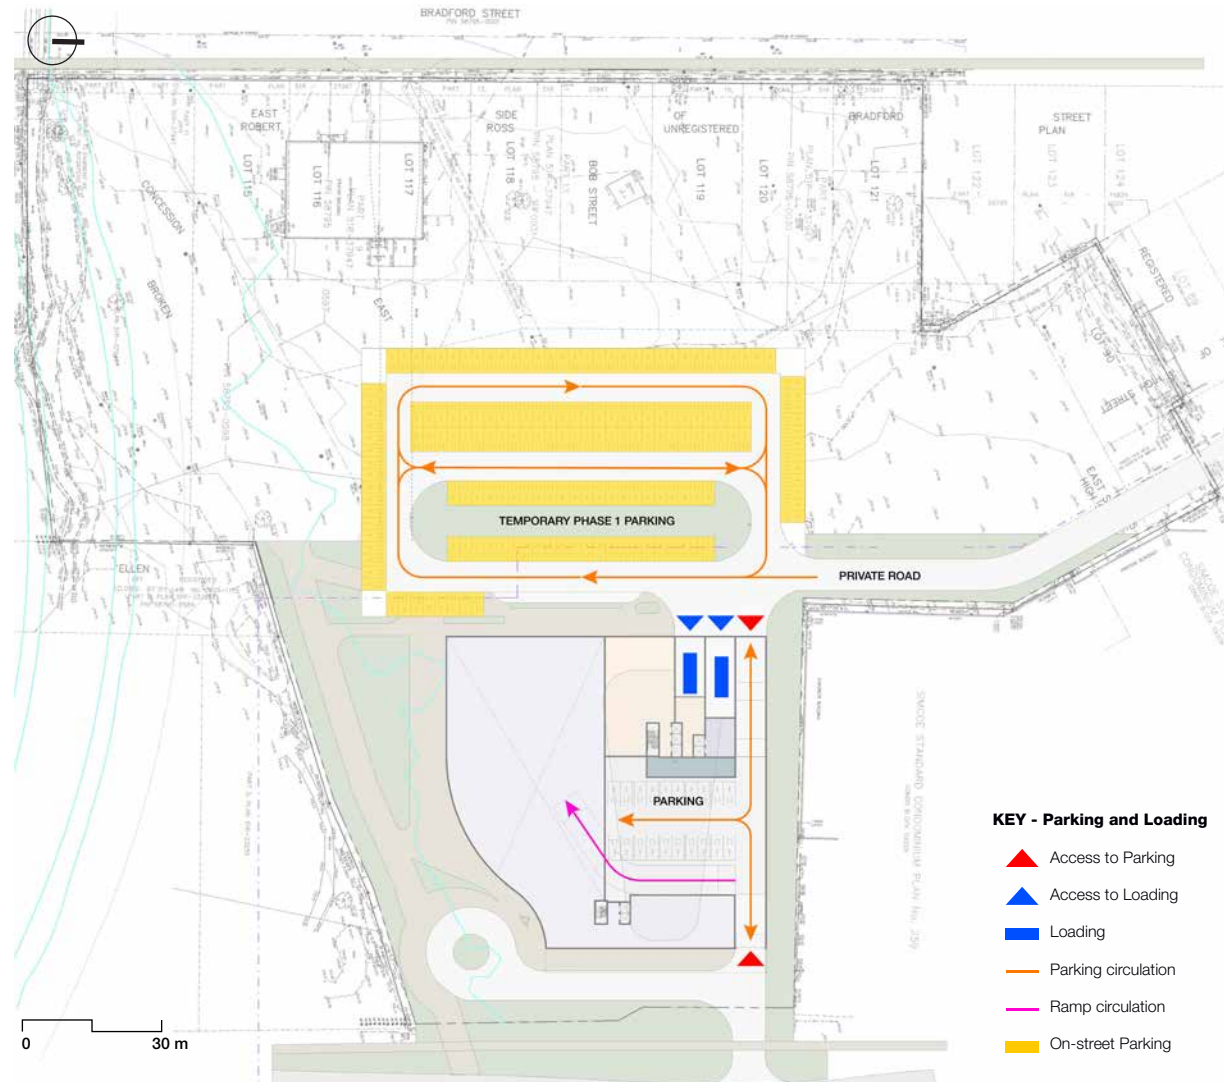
PHASE 1 Ground Floor plan - Parking and Loading access
